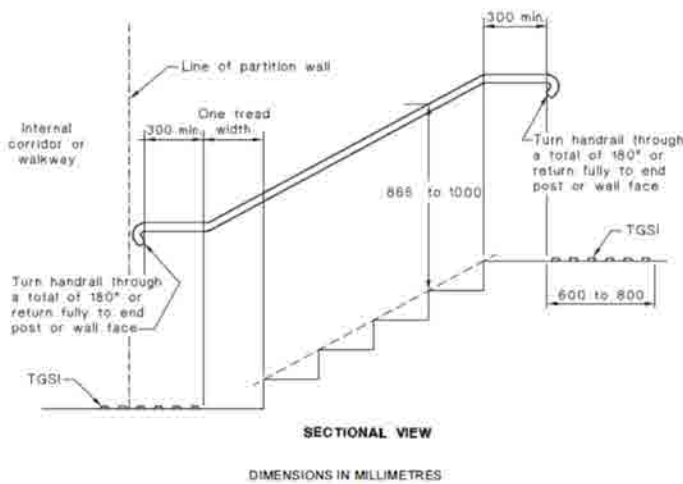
(B) STAIRWAY LOCATION AND HANDRAIL EXTENSIONS AT END OF STAIRWAY OTHER THAN AT LINE OF BOUNDARY
